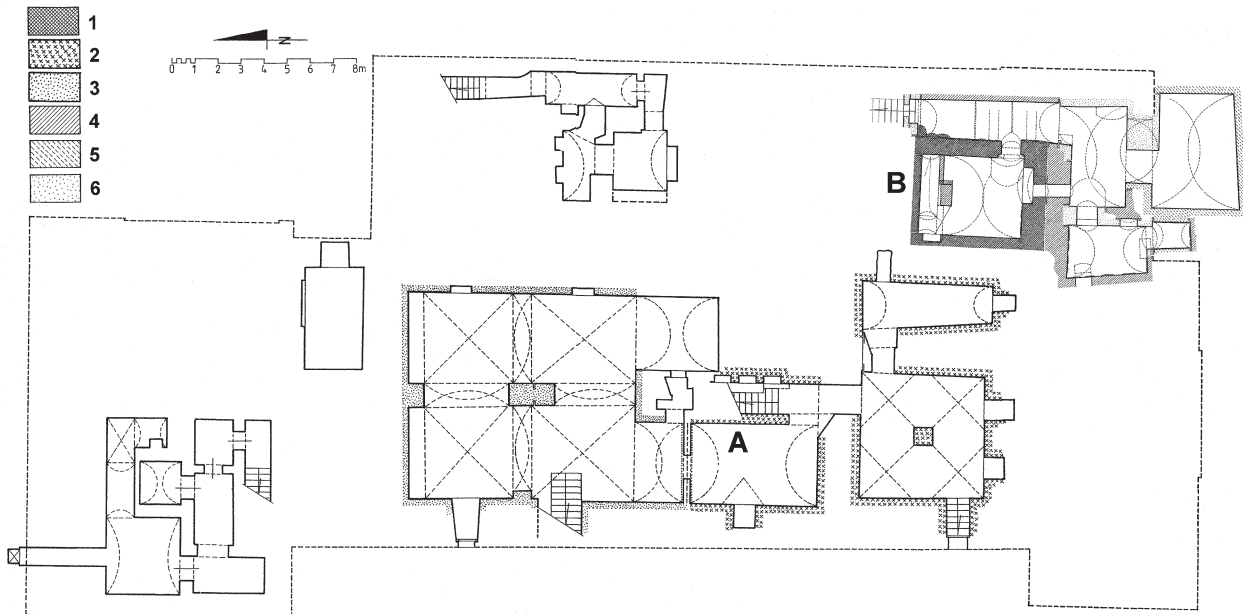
Plan of basements of the middle wing of the town hall and old burgher townhouses with layers of the examined walls: 1) walls from the 15th century, 2) walls from the 1540s, 3) walls from the 1660s–1670s, 4) walls from the 17th/18th century, 5) walls from the 18th century, 6) walls from the end of the 19th century, A) basements of the first town hall building, B) basement of the chamber-shop in the commercial building (by J. Burnita, C. Lasota, A. Legendziewicz)
